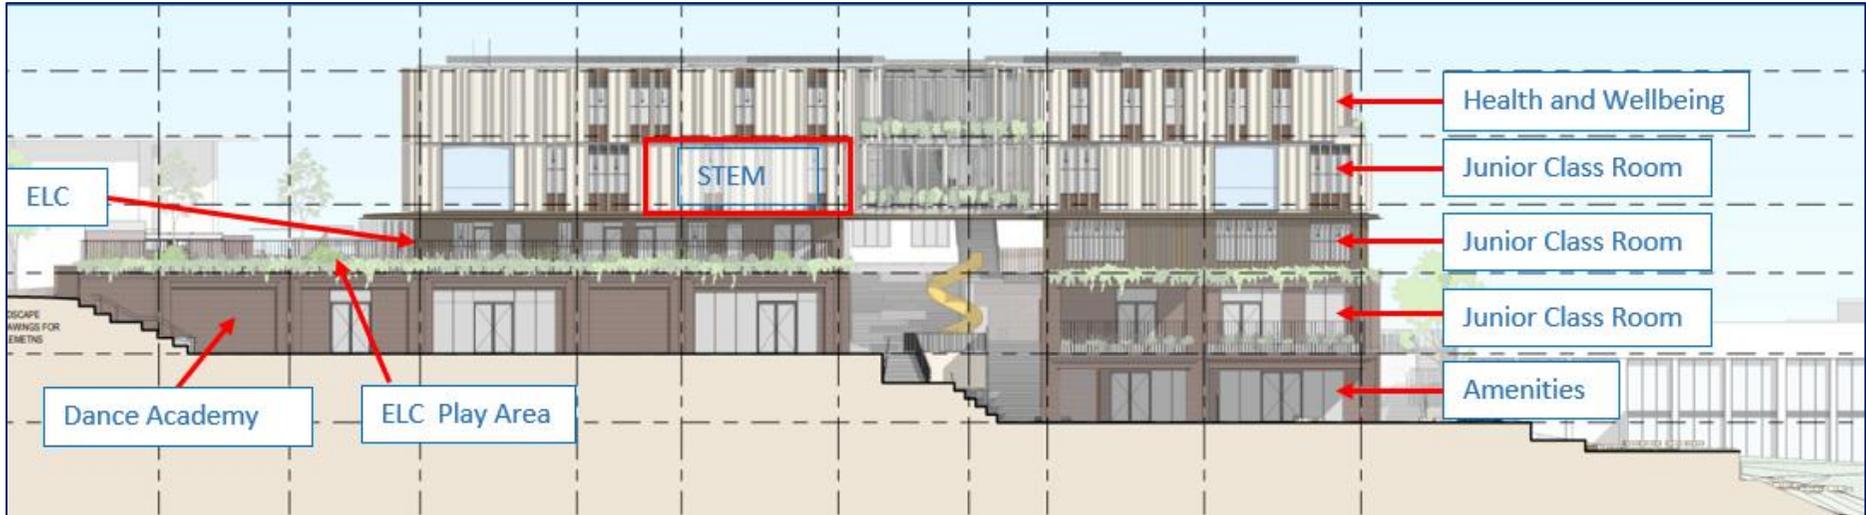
| South-east elevation of the proposed building (Source: Applicant's RtS 2022)
